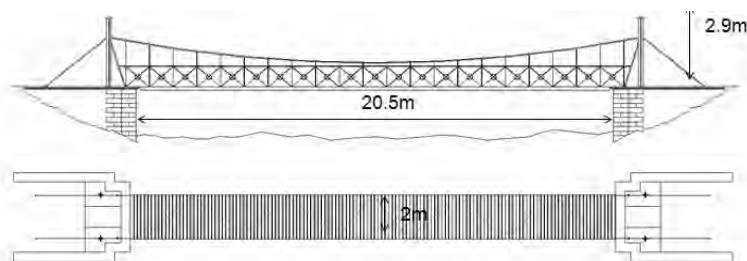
Elevation and plan of the authentic suspension system and non authentic deck.
